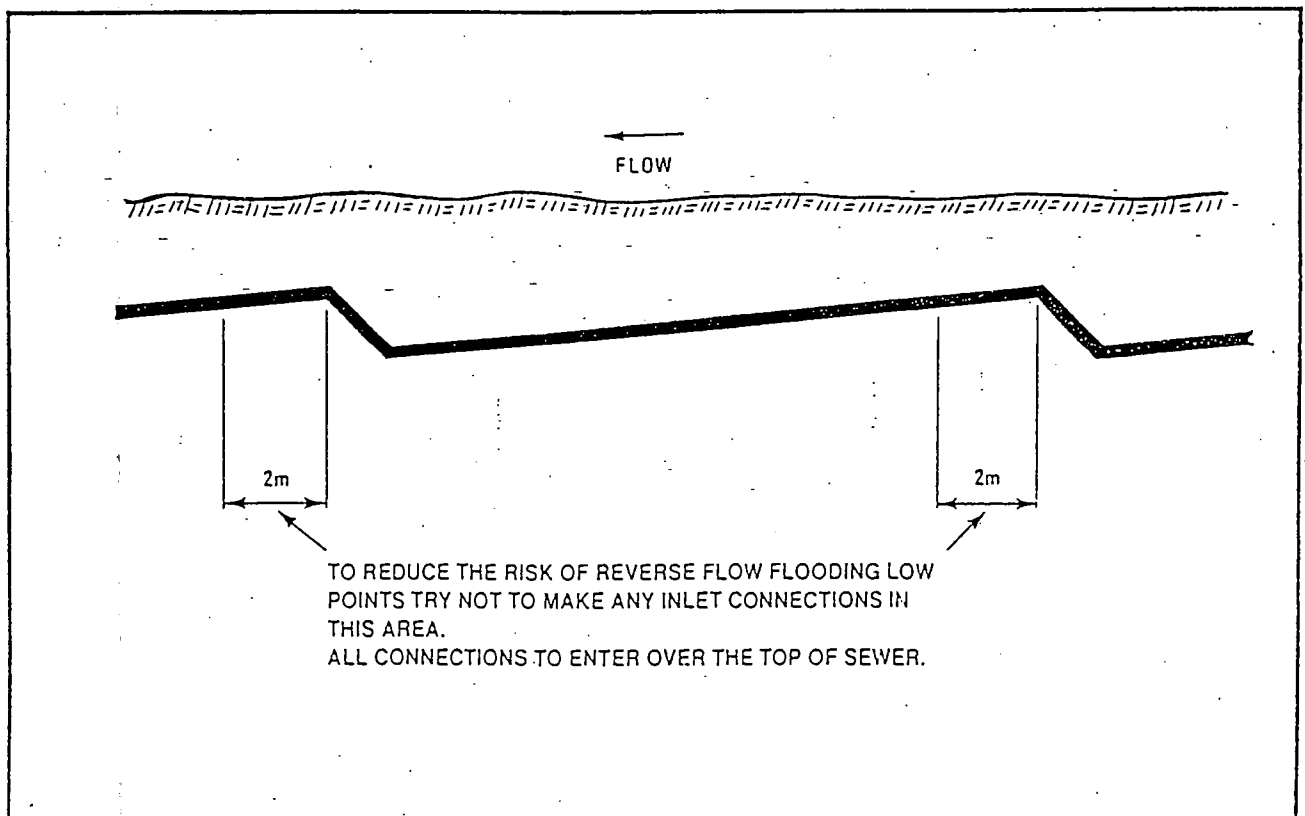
CONNECTION POSITIONS TO INVERT LIFT PROFILE
